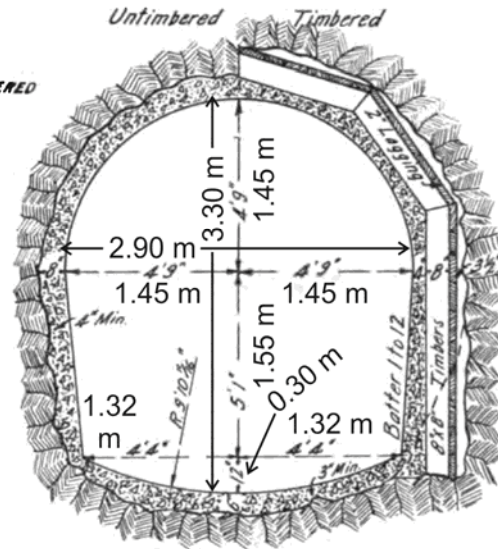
Design cross section and hydraulic properties of the Elizabeth Tunnel. Modified from City of Los Angeles (1916).
